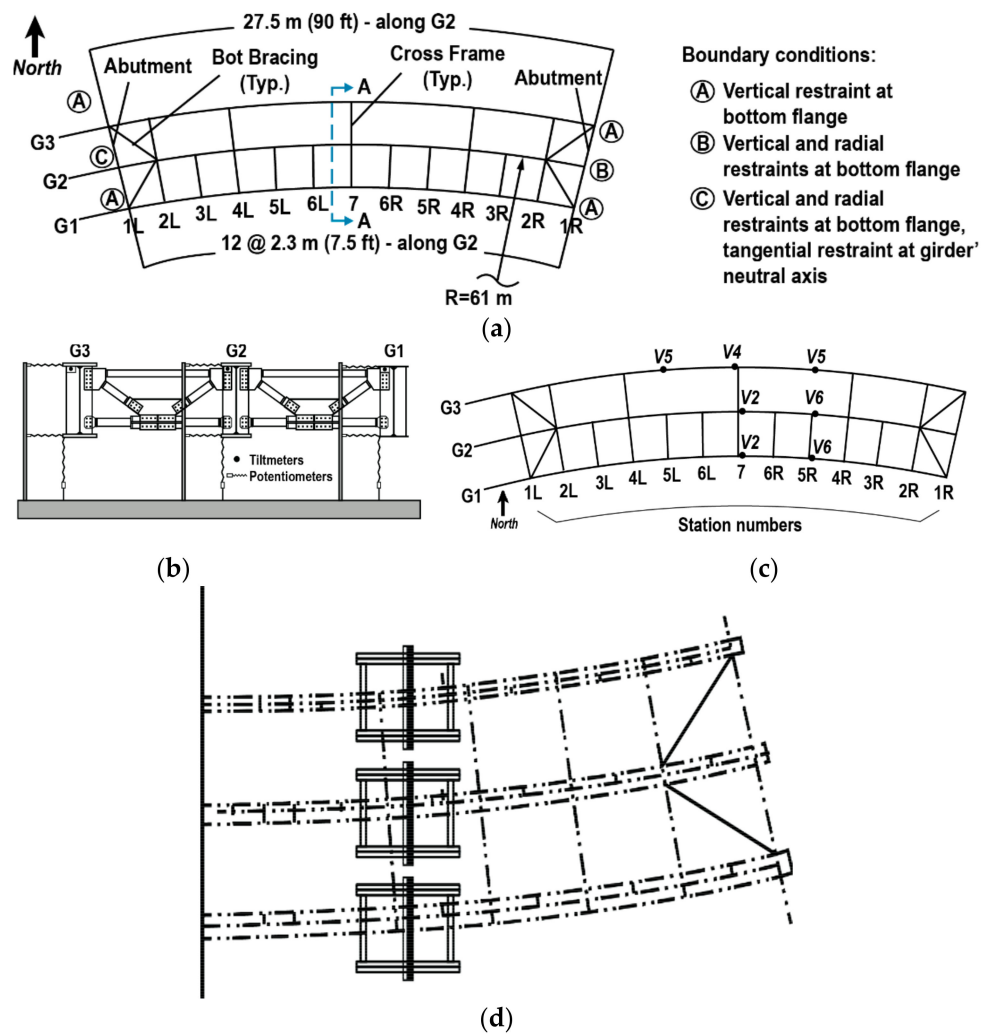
Scaled bridge constructed for the laboratory tests at Turner–Fairbank Highway Research Center: (a) plan view; (b) cross-section; (c) location of instruments; (d) loading conditions.
